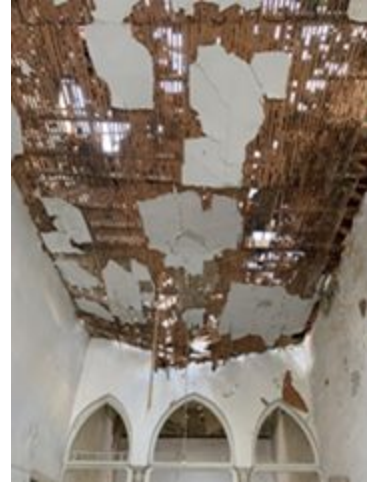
Partially collapsed (D4) stone masonry building SM4 (33.8948° N, 35.5161° E).
